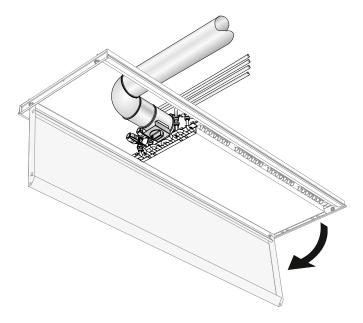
Example showing accessibility to an inactive section and horizontal connections to the side when the face plate is swung open from its hinges.
